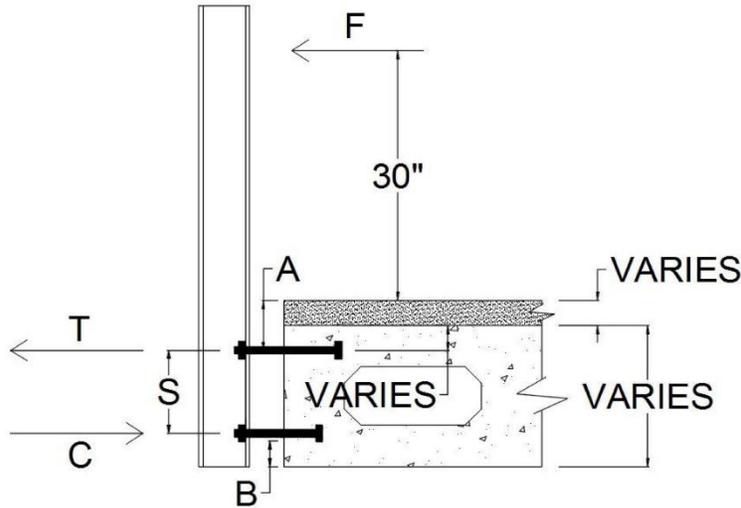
Concrete Box-Beam Girder with Concrete Top, Preliminary Anchor Loadings
